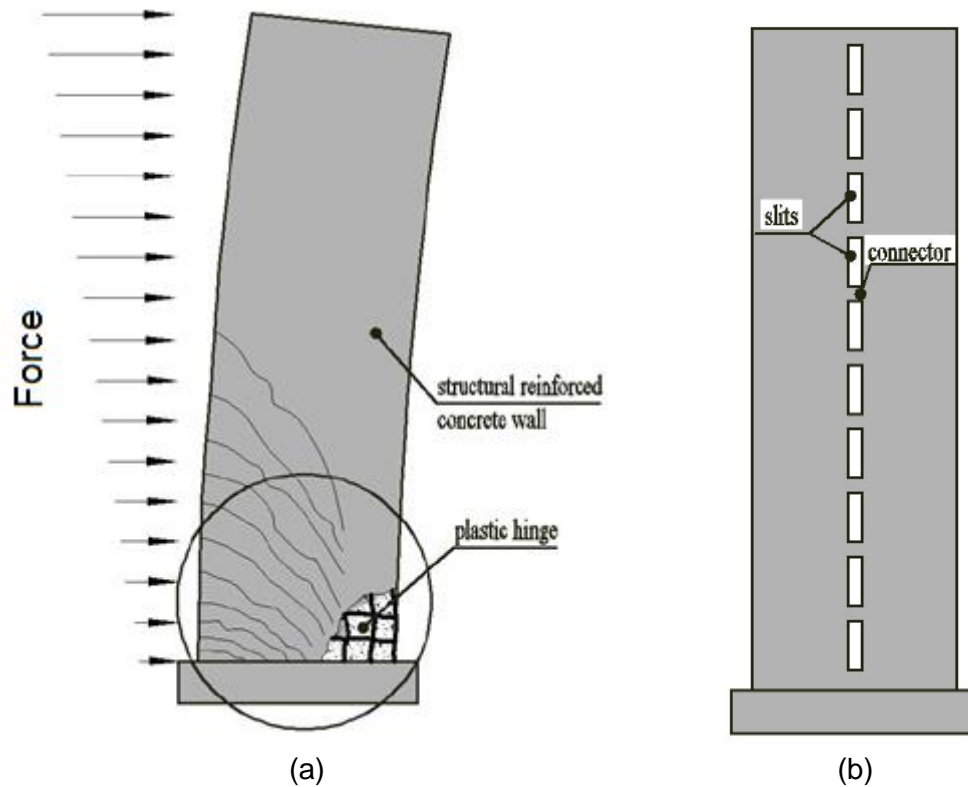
(a) Destruction of reinforced concrete walls at horizontal seismic action, (b) Reinforced concrete slit wall with shear connections (Baetu, 2011)
